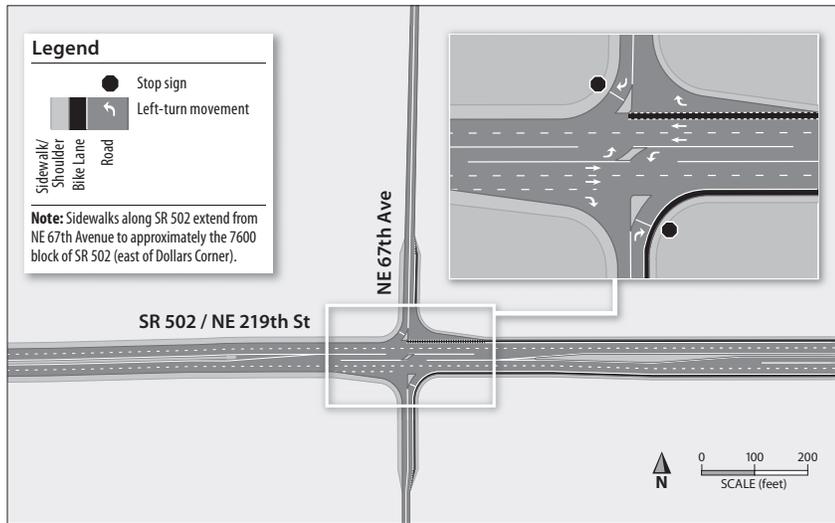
Proposed directional median opening at NE 67th Ave under the Build Alternative
